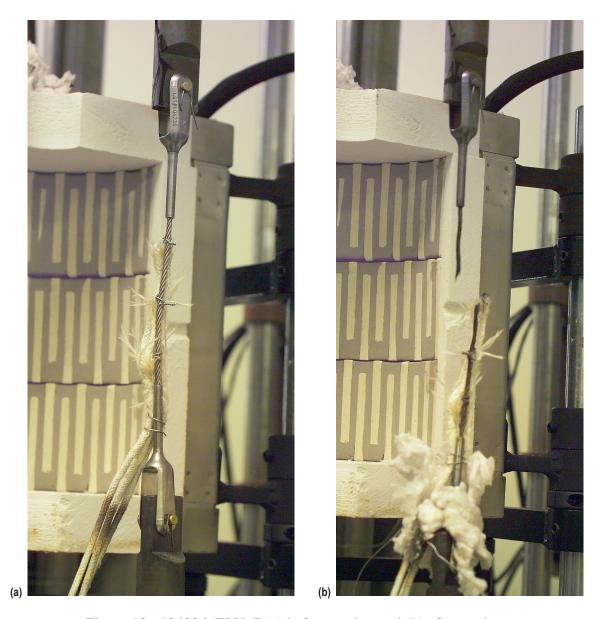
104236–ELV–7 (a) before testing and (b) after testing.
